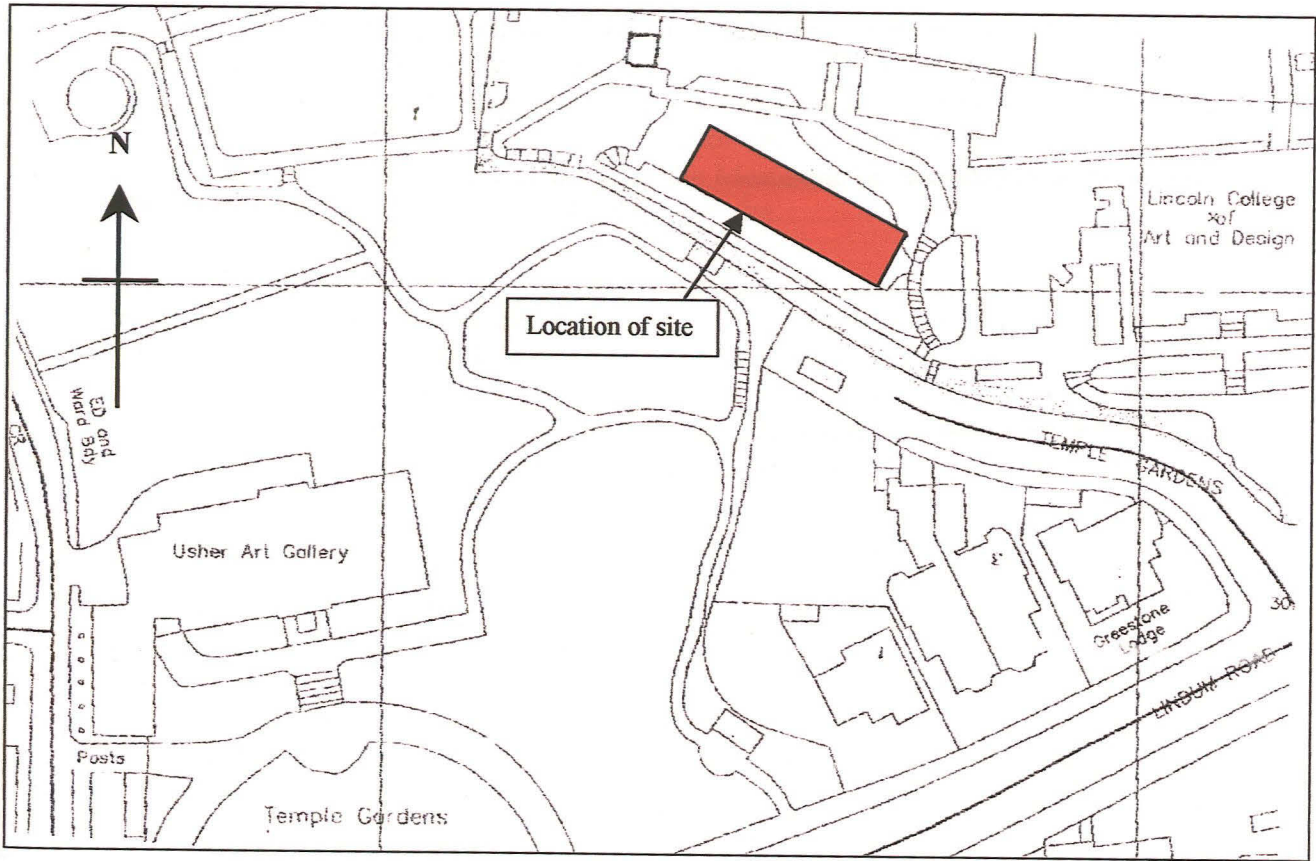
Site location plan: the development area is shown in red. Scale 1:1000.
